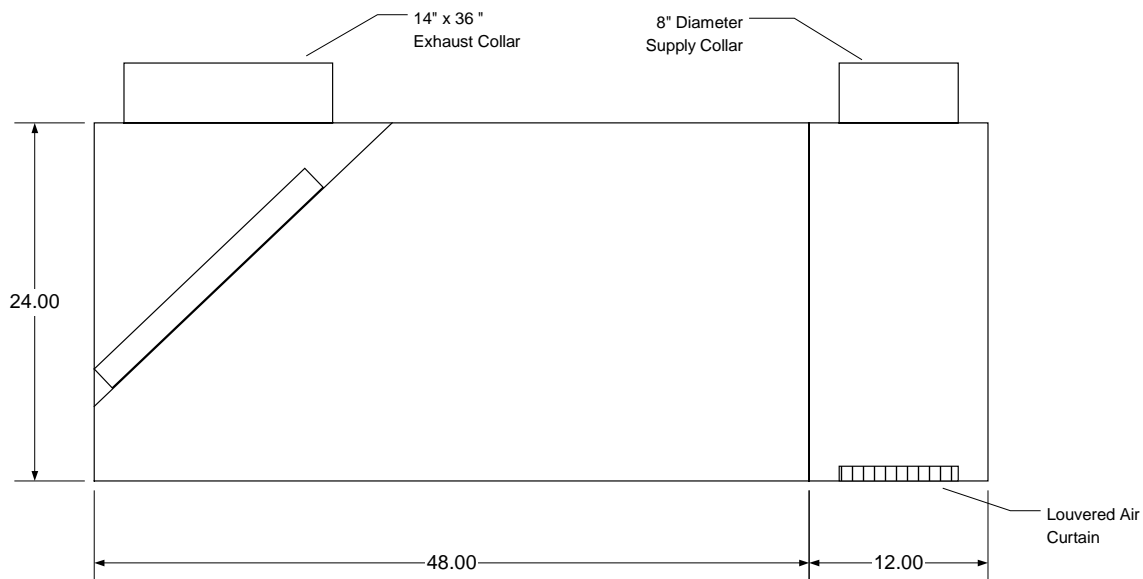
Cross-Section Drawing of the Wall Mounted Air Curtain Canopy Hood.
